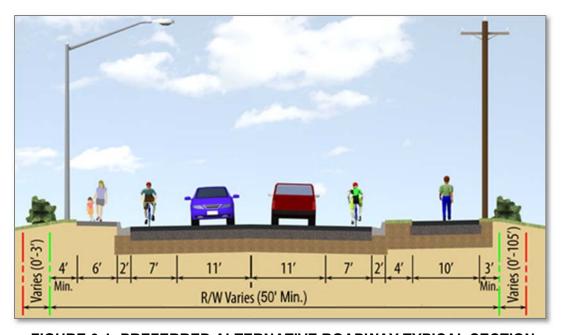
PREFERRED ALTERNATIVE ROADWAY TYPICAL SECTION
